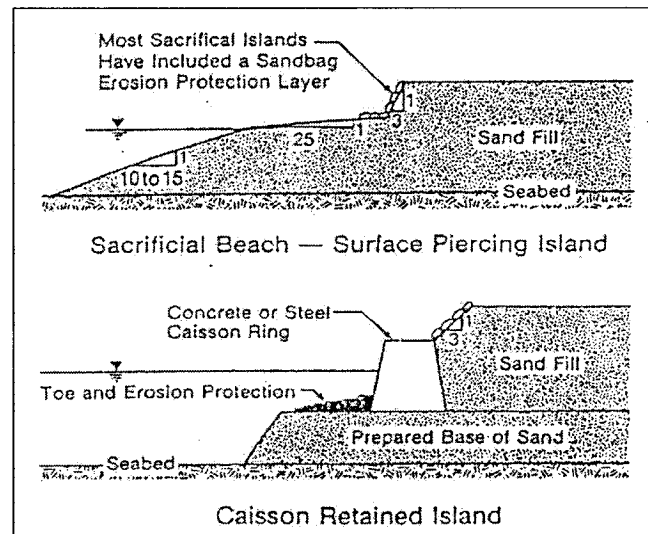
Surface piercing island and caisson retained wall (Mitchell (1988))
